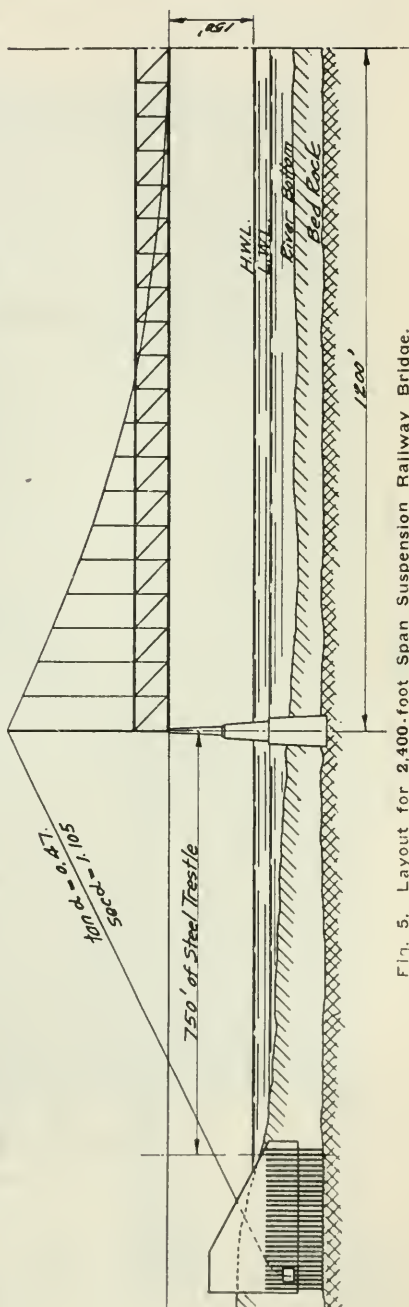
Layout for 2,400-foot Span Suspension Railway Bridge.
